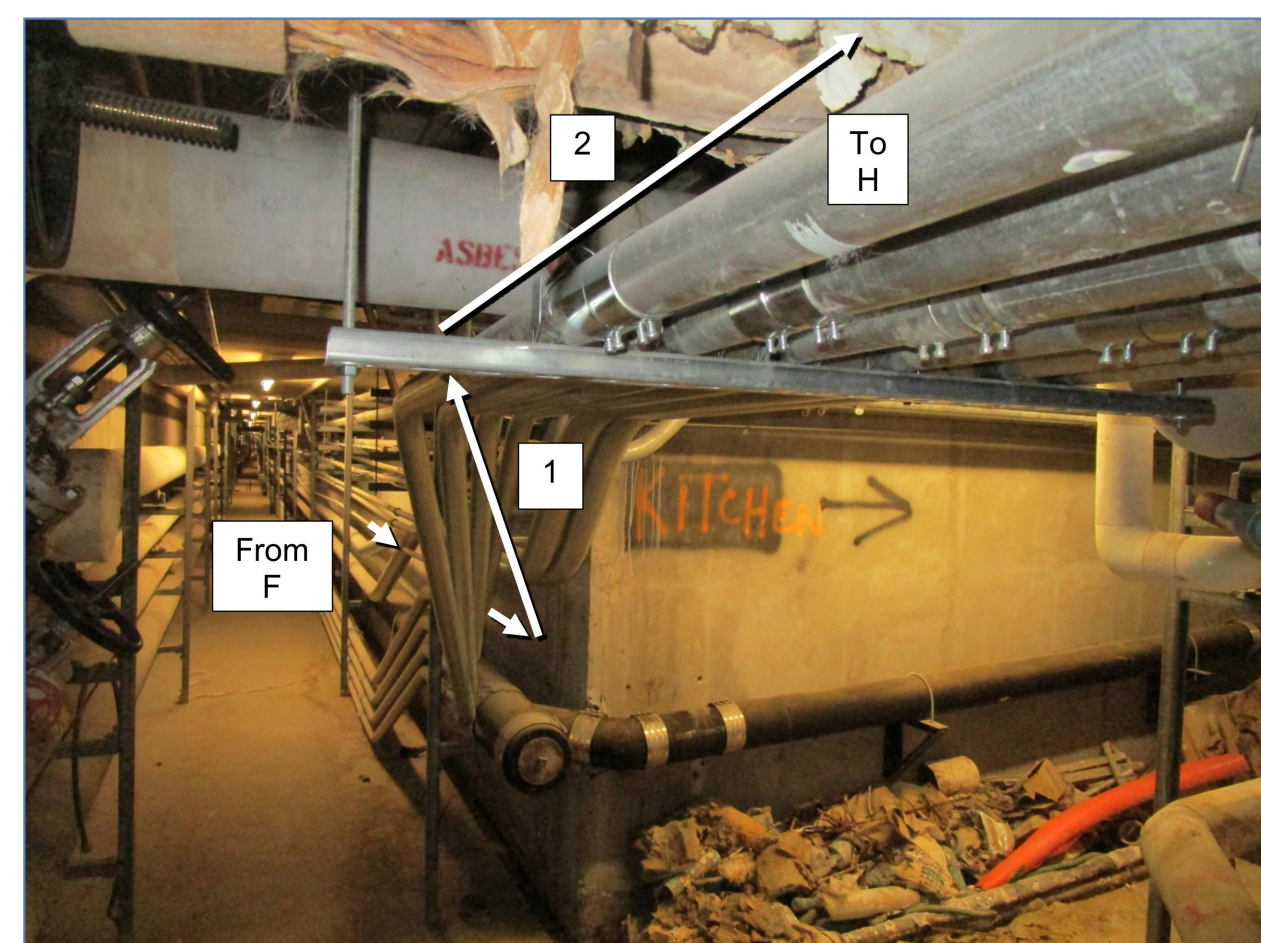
Location G, transition from wall to channel suspended from tunnel ceiling
